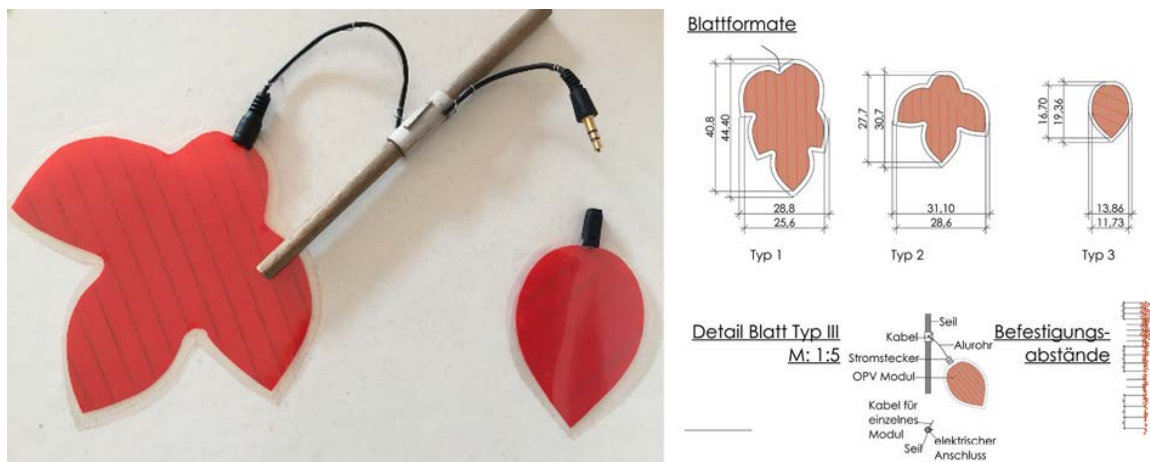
Giulia Rudloff and Katarina Sokac, model 1:2, drawing (leaf sizes, detail leaf type III, fixing distances)
